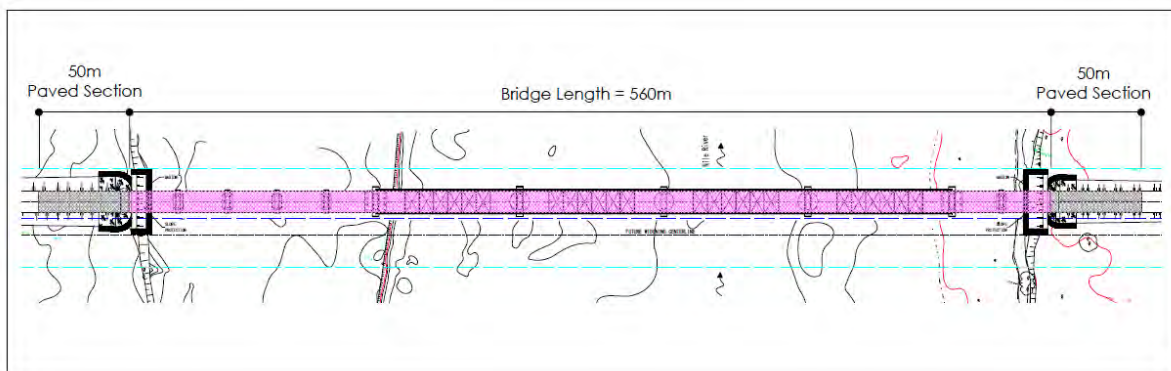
Location of Concrete Pavement Construction (Approach Road (1))
